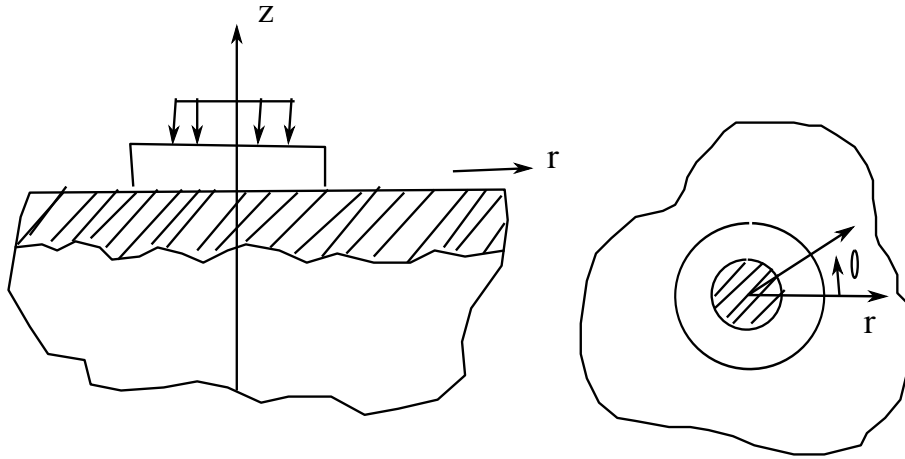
Haul road cross-section under axisymmetry loading [43]
